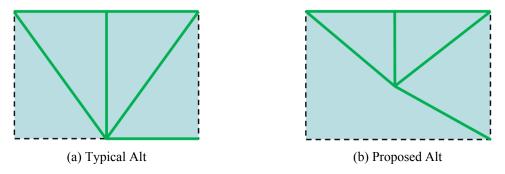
Comparison between a typical Alt and a proposed Alt for outrigger truss layouts
